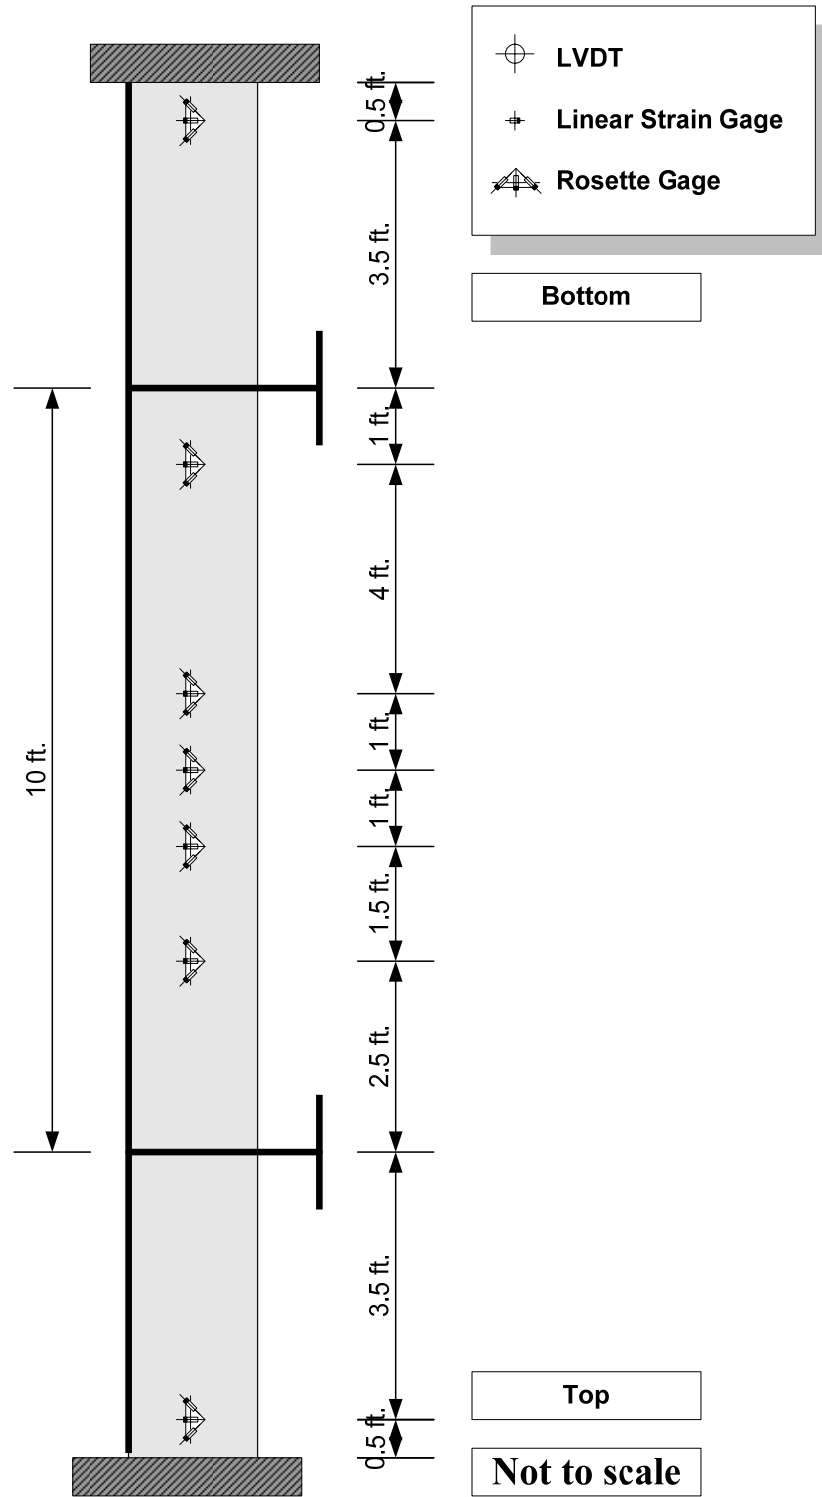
Instrumentation Plan for Single Rib Beam-column, SBC
